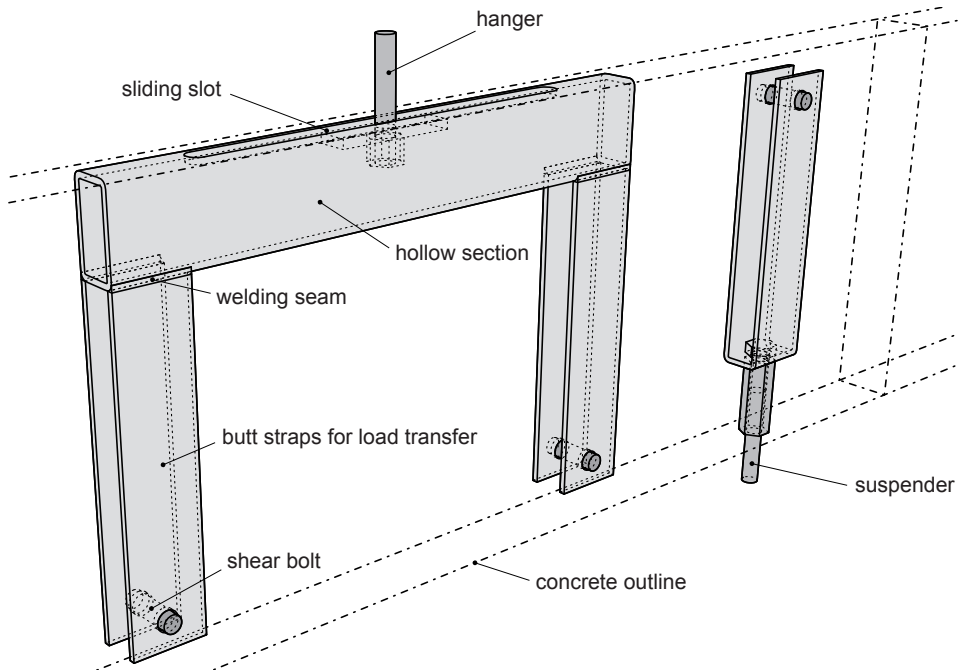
Embedded steel items for the concrete mobile, to transfer concentrated loads around prestressing hulls
